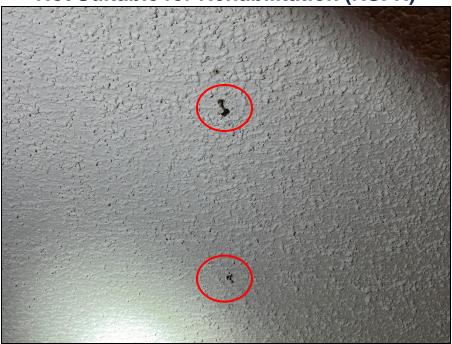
Typical view of ceiling displaying moisture staining in the living room.
